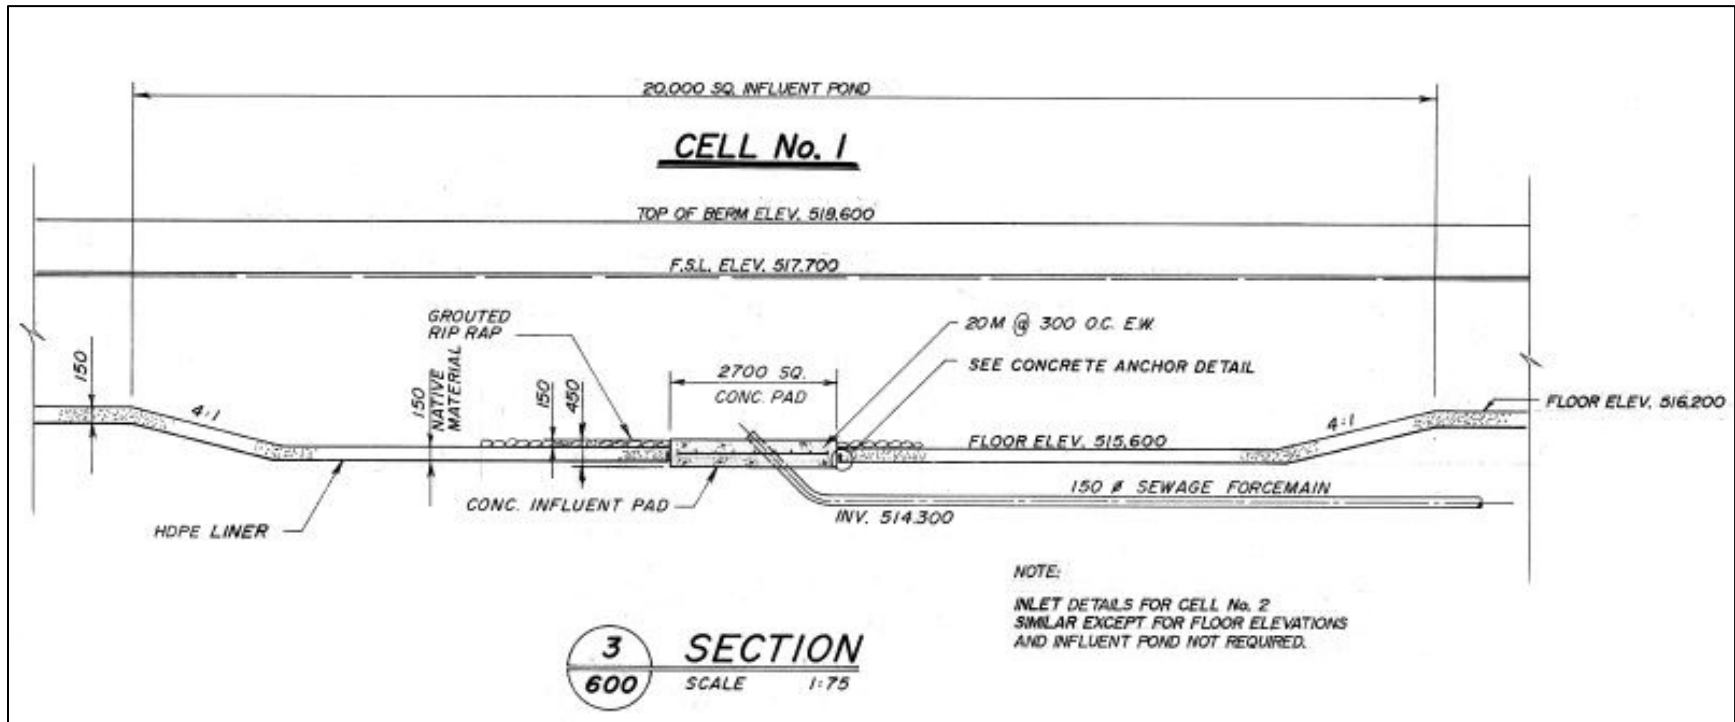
1988 Construction drawing - Cross section of Cell #1 at intake pipe (Modified from Bullée Consulting Ltd. 1988c)
